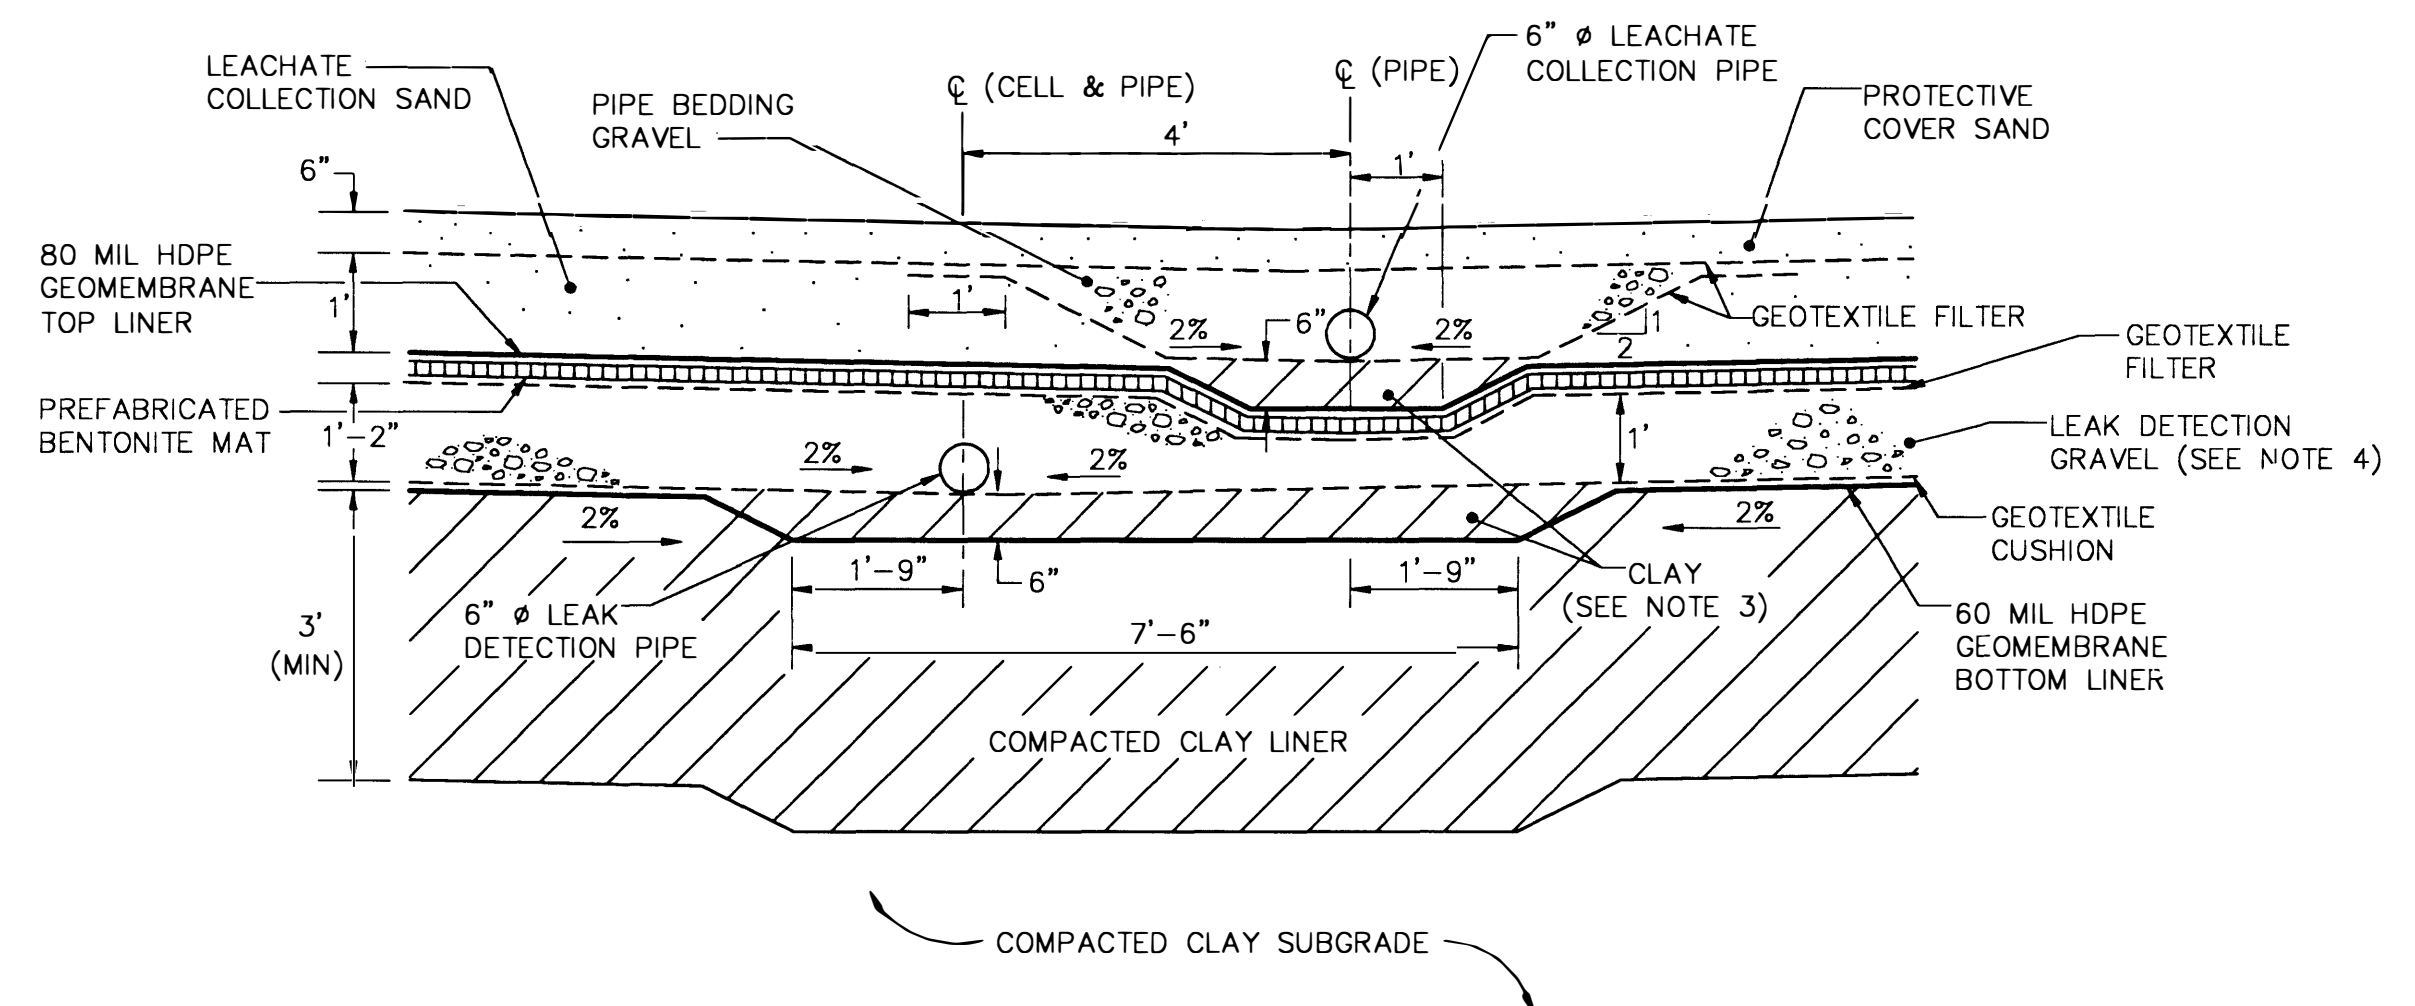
Above Ground Hazardous Waste Landvault No. 2 Leachate Collection/Detection Sump Details
